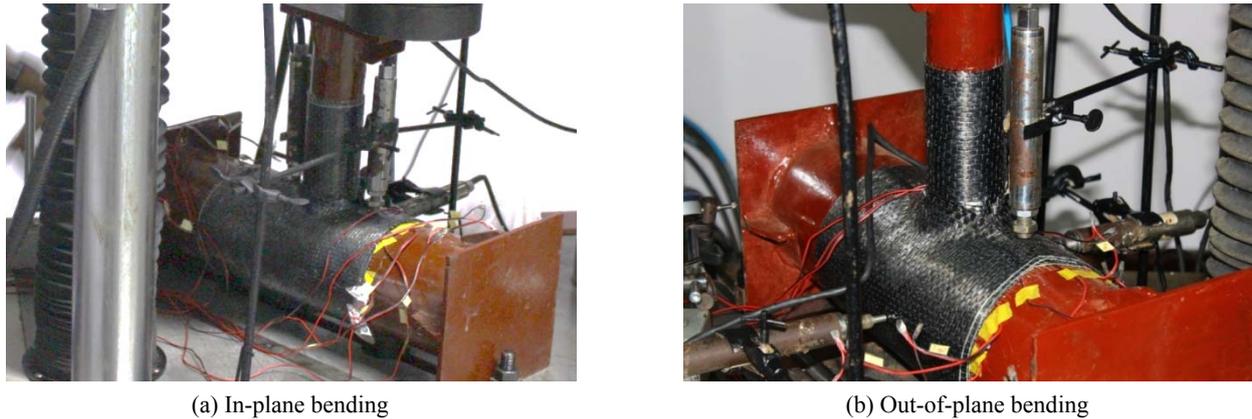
Arrangement of CFRP wrapped T-joint specimen on UTM
